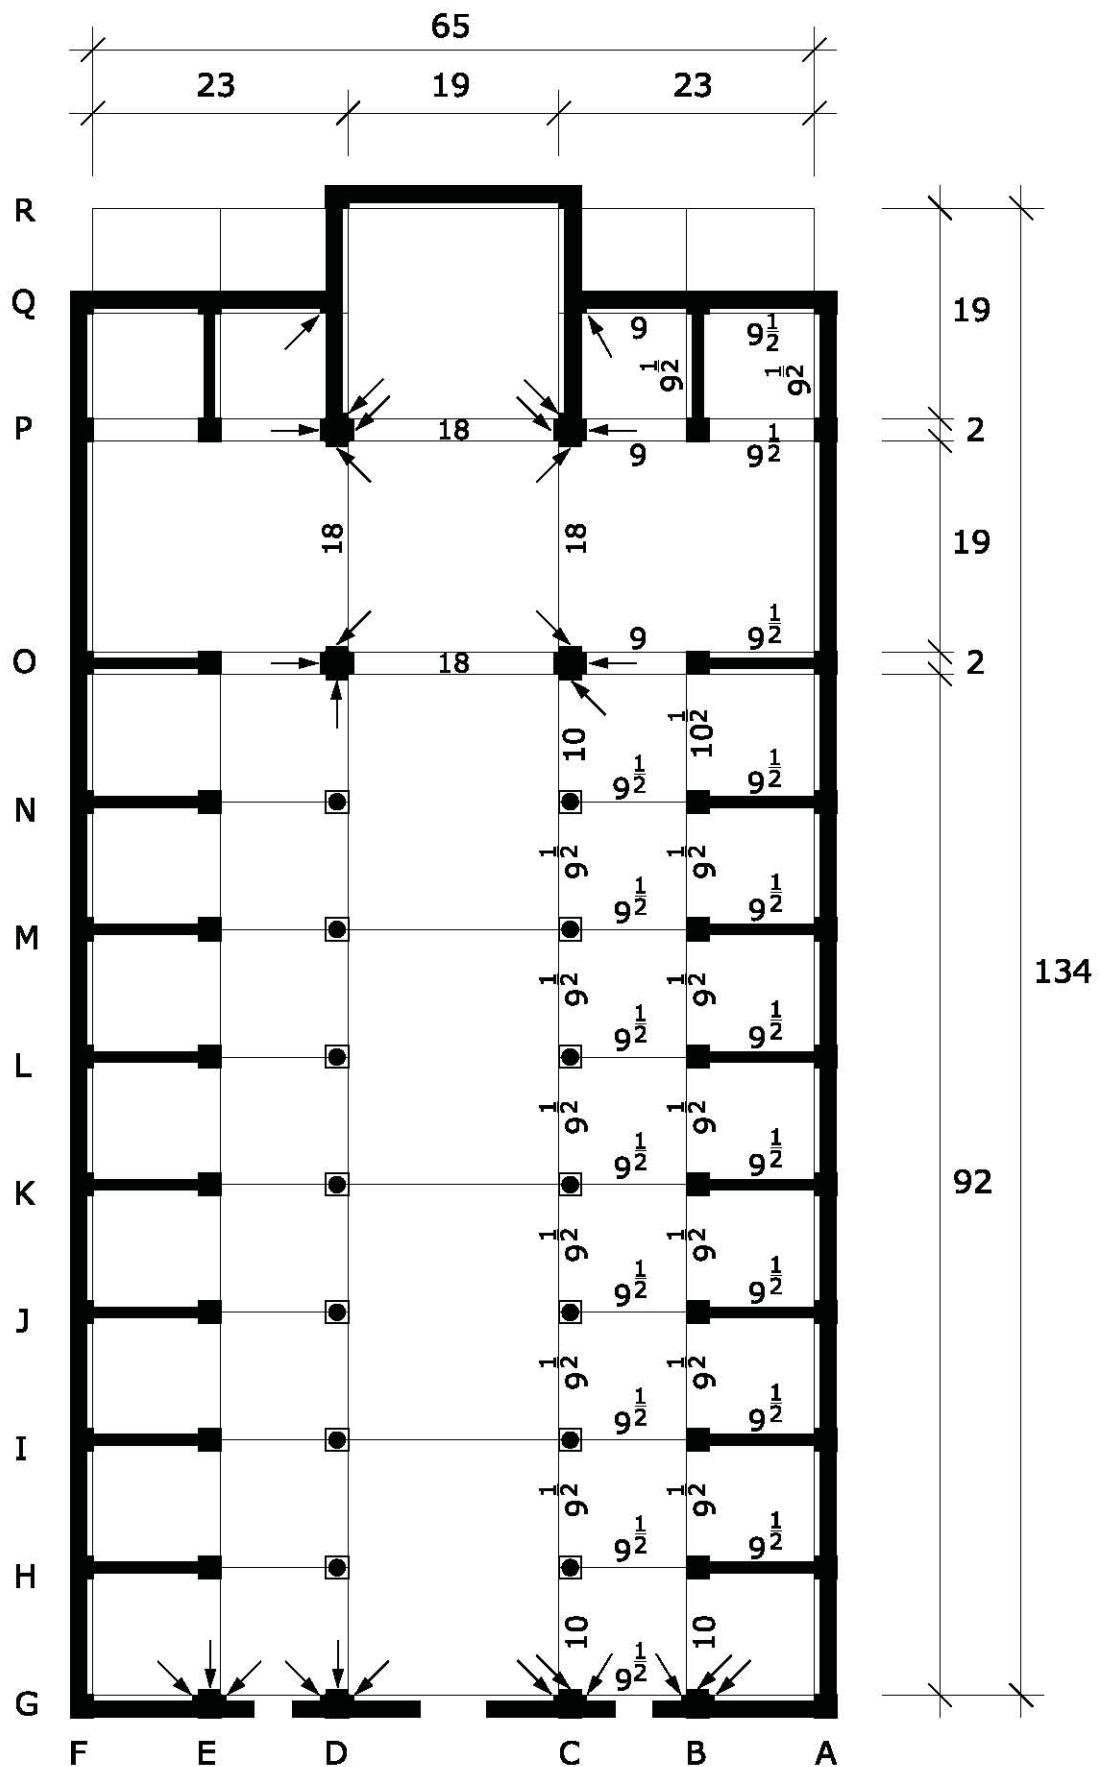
Basilica of San Lorenzo, hypothetical reconstruction of the design process, Step 9: Insert Crossing Pilasters and Miscellaneous Pilasters (indicated by arrows).
